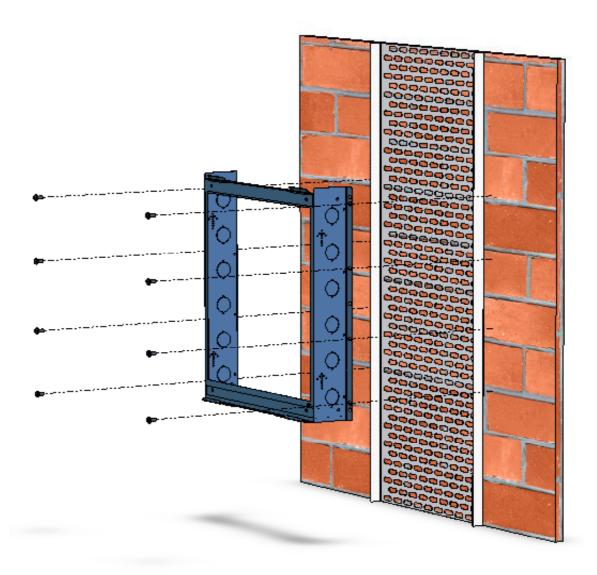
Wall Mounting A Wall Mount Dimmer Over Cable Tray
